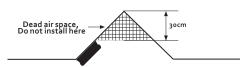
RECOMMENDED INSTALLATION LOCATION FOR ROOMS WITH SLOPED, PEAKED OR GABLED CEILINGS.
